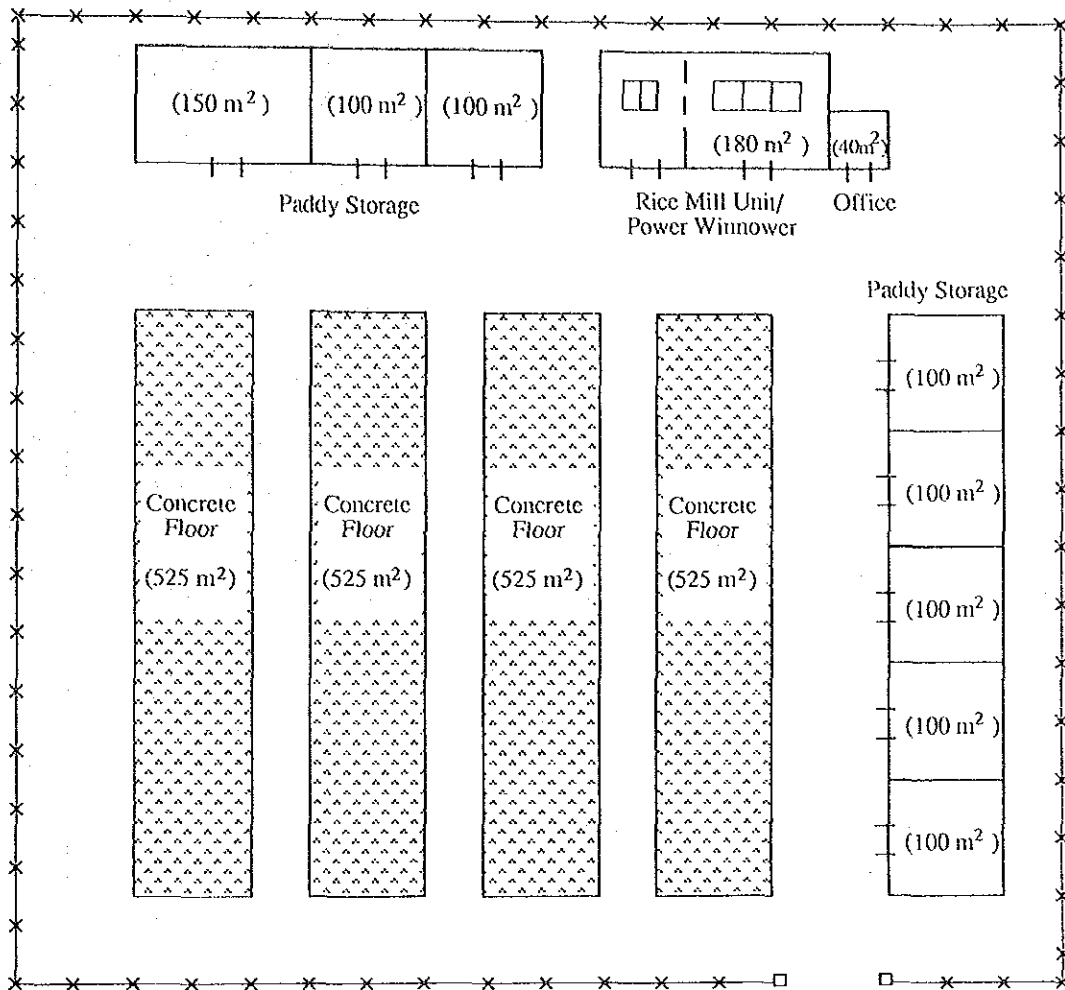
TYPICAL LAYOUT OF RICE MILL FACILITY
